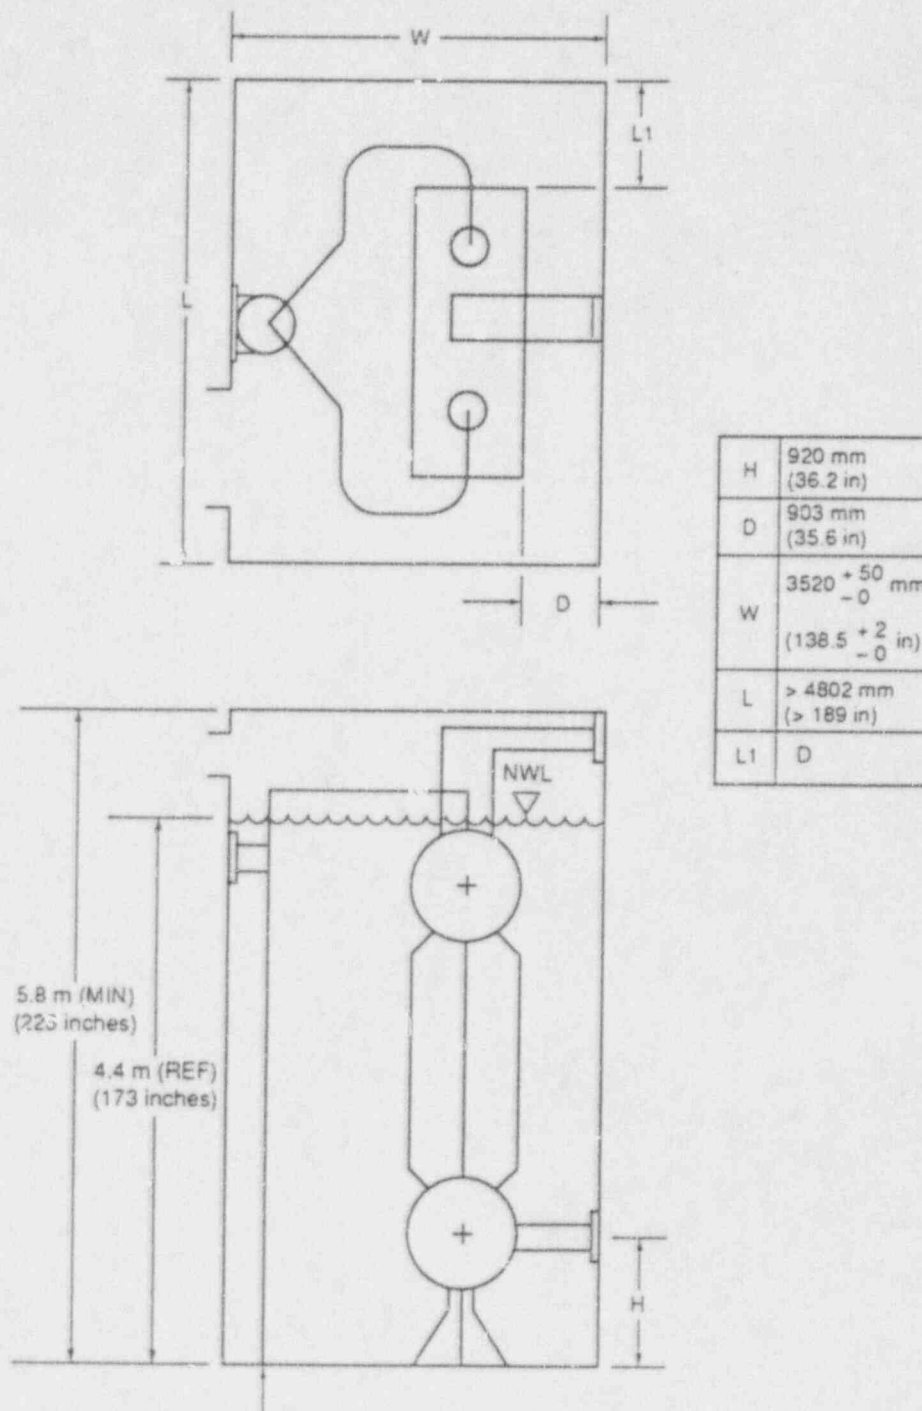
REQUIRED DIMENSIONS FOR IC TEST POOL
